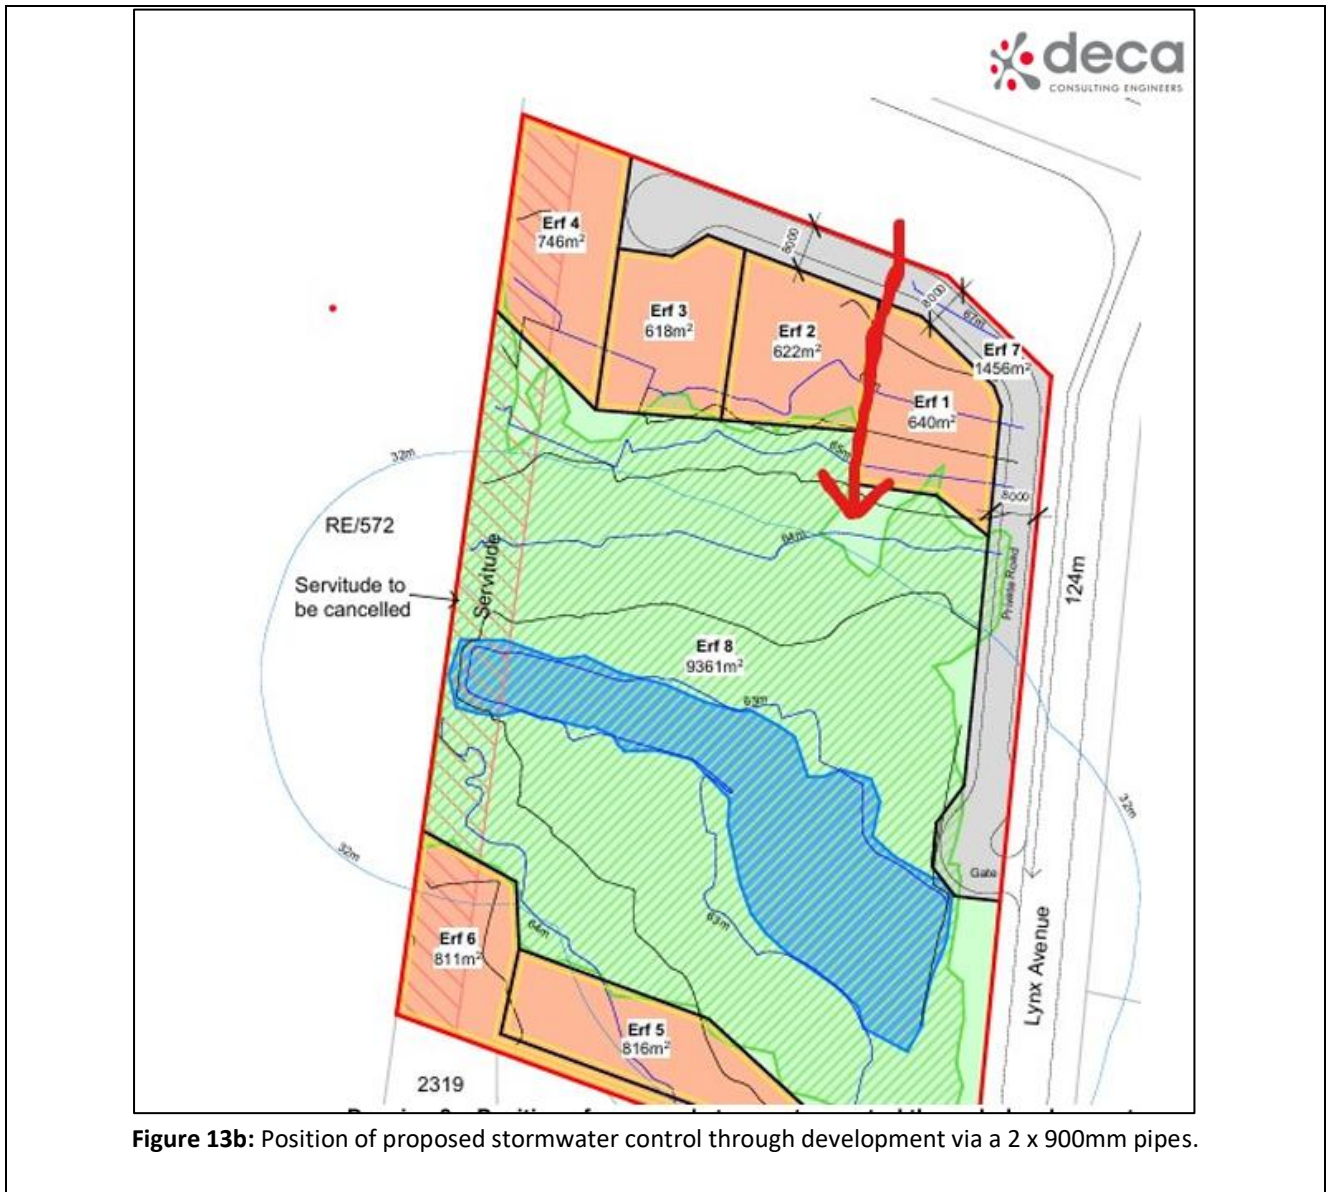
Position of proposed stormwater control through development via a 2 x 900mm pipes.
